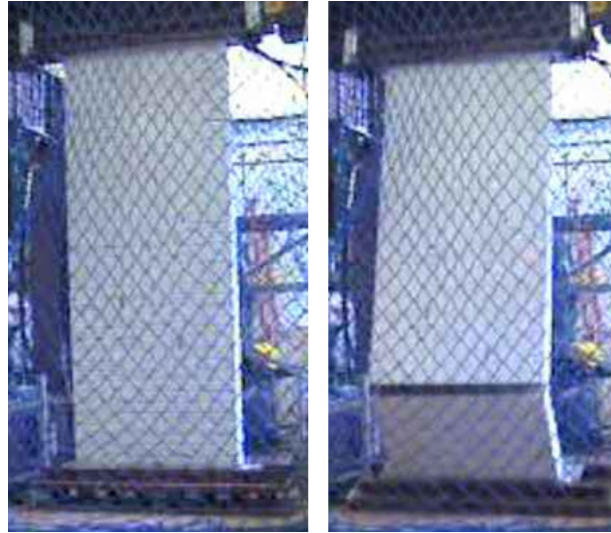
138 Wall W#8 at the beginning of the test (left) and failing (right)
